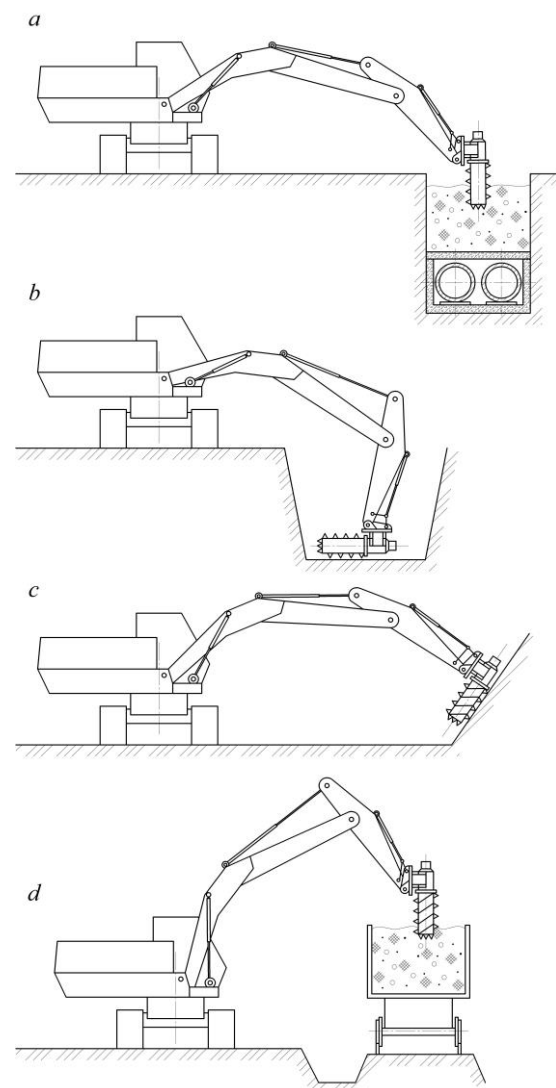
Technological work schemes of the excavator with the replaceable milling head: *a* – opening of underground engineering networks; *b* – planning of walls and bottom of trenches; *c* – planning of pit slopes; *d* – loosening of non-metallic materials
